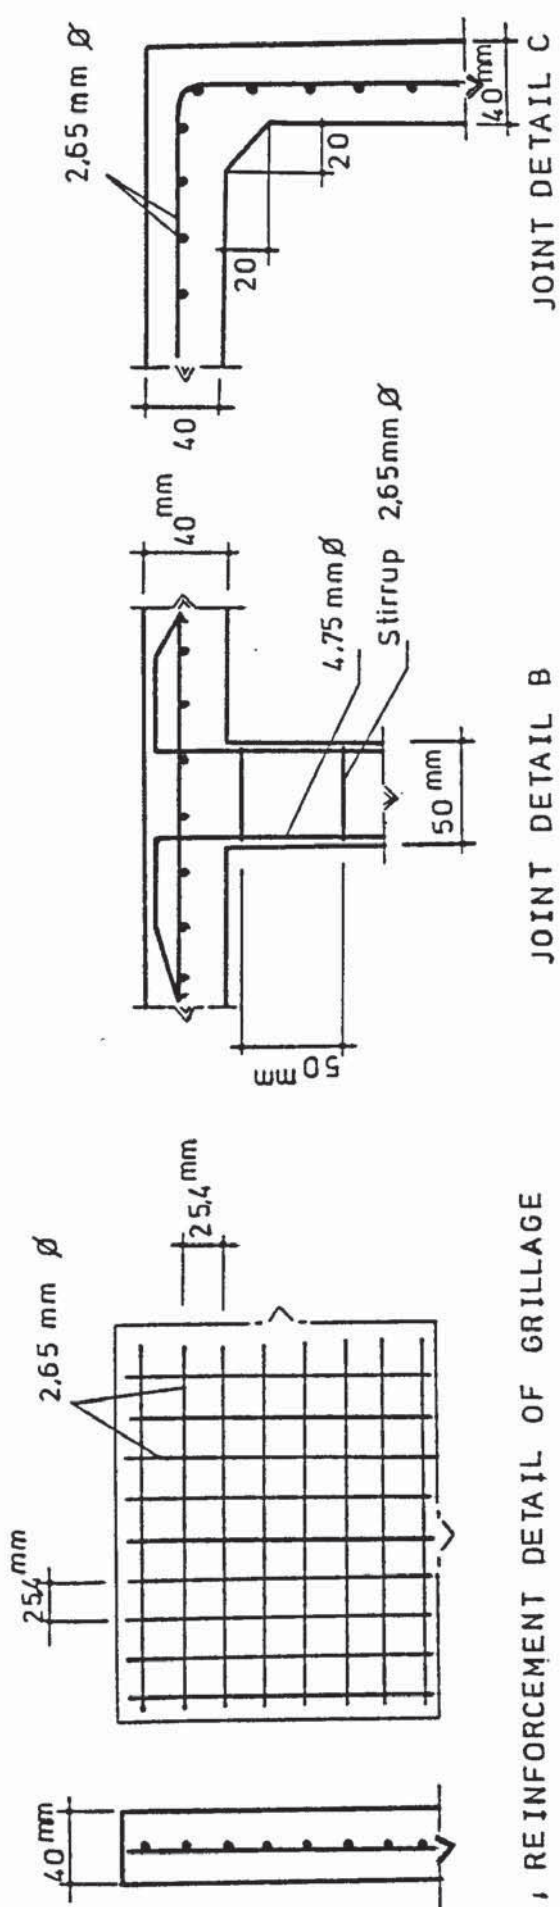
A SINGLE STOREY REINFORCED CONCRETE STRUCTURE
